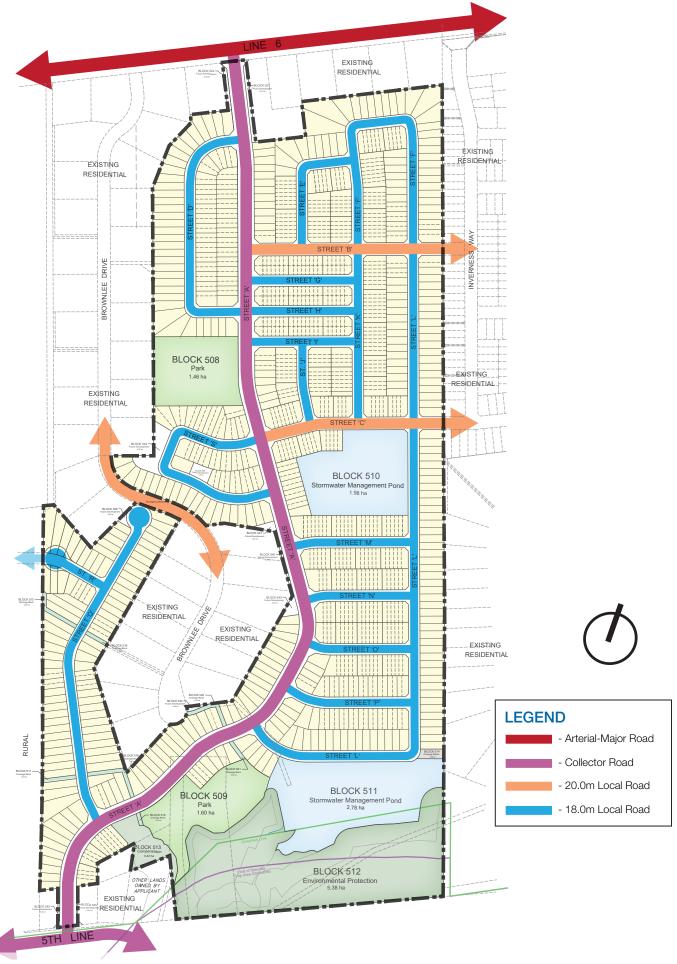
Bradford Highlands Joint Venture Street Hierarchy Plan
